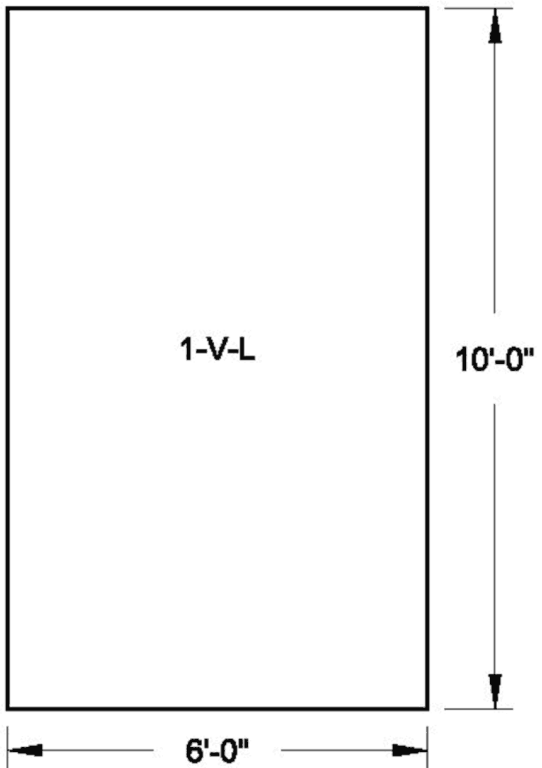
H.6-162 DGFOV Roof 6 Looking Down
